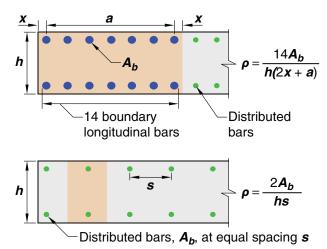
Longitudinal reinforcement ratios for typical wall boundary conditions.
